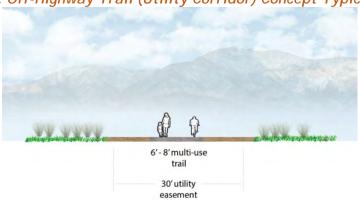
Off-Highway Trail (Utility Corridor) Concept Typical Section
